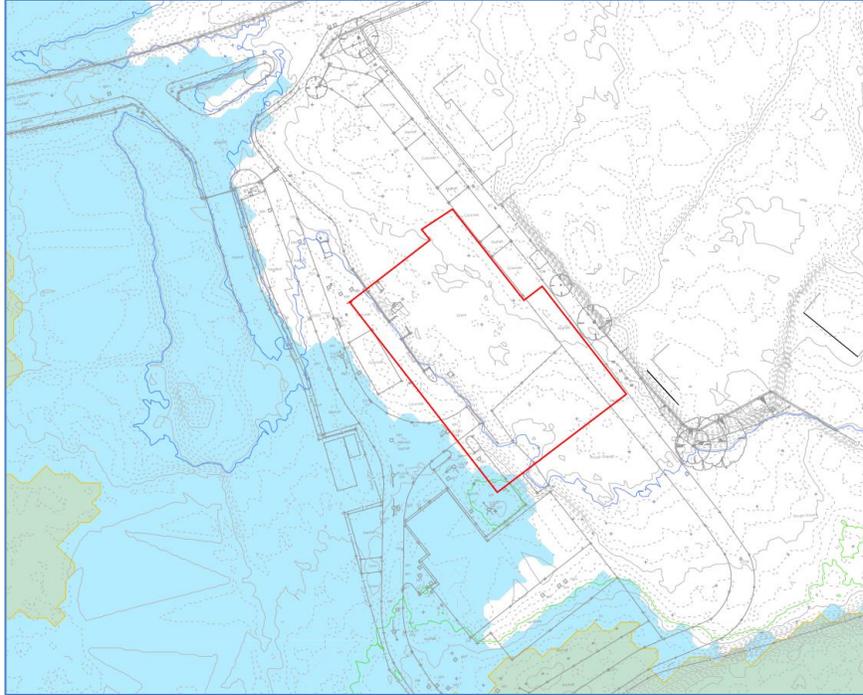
Plan showing flood zone C2 in relation to the outline of the proposed building
